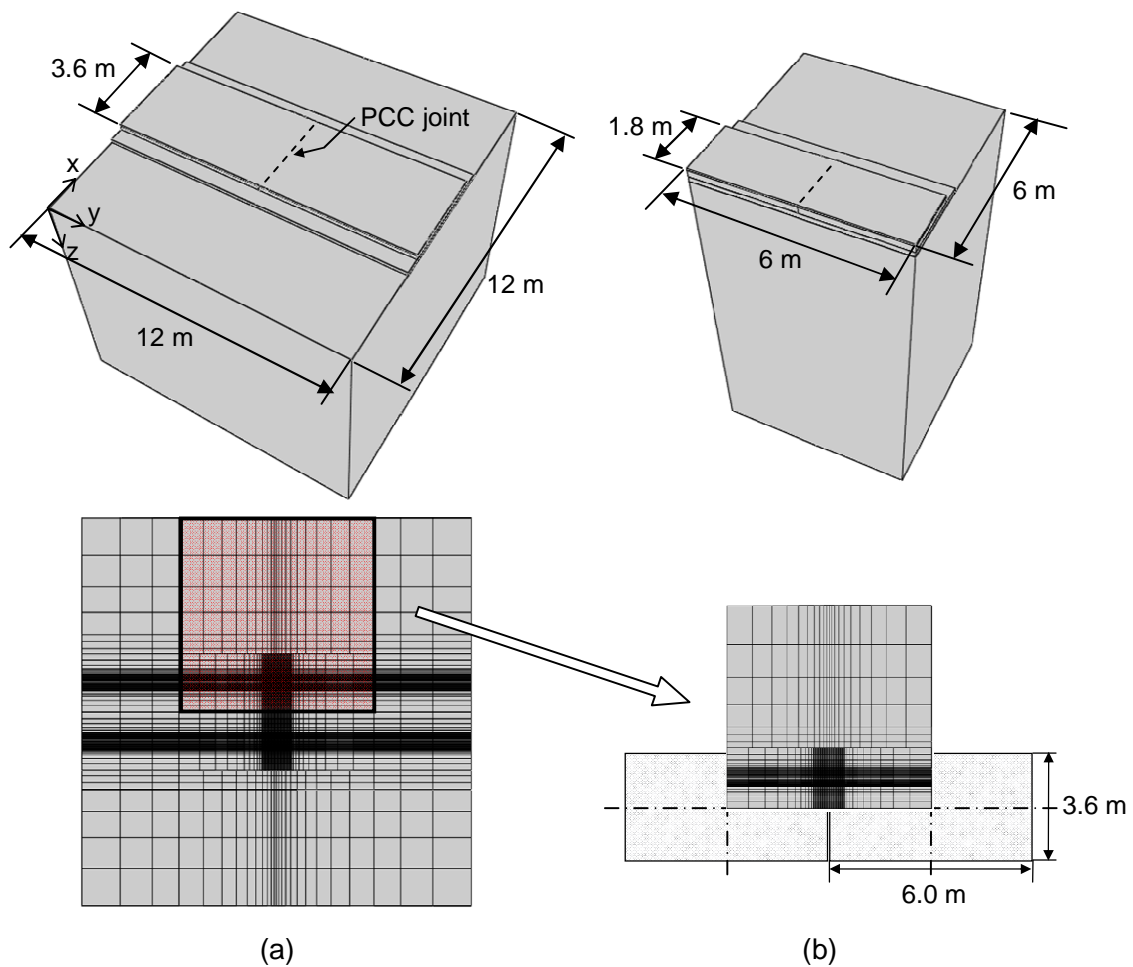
Geometry of (a) full-scale and (b) quarter-scale pavement models.
